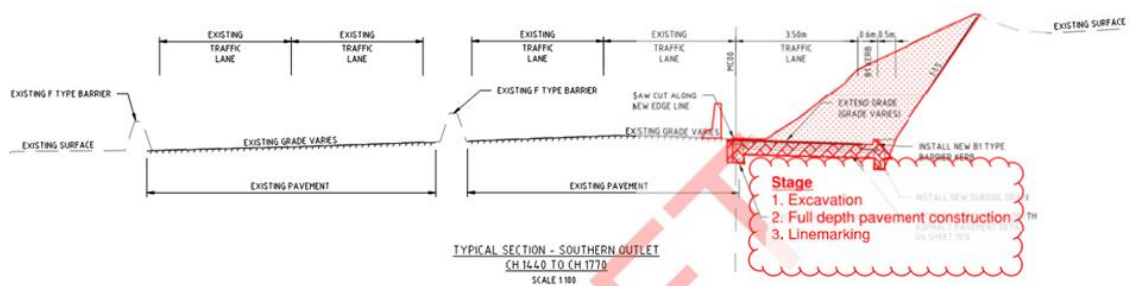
Typical section – Southern Outlet Ch. 1440 to Ch. 1770
